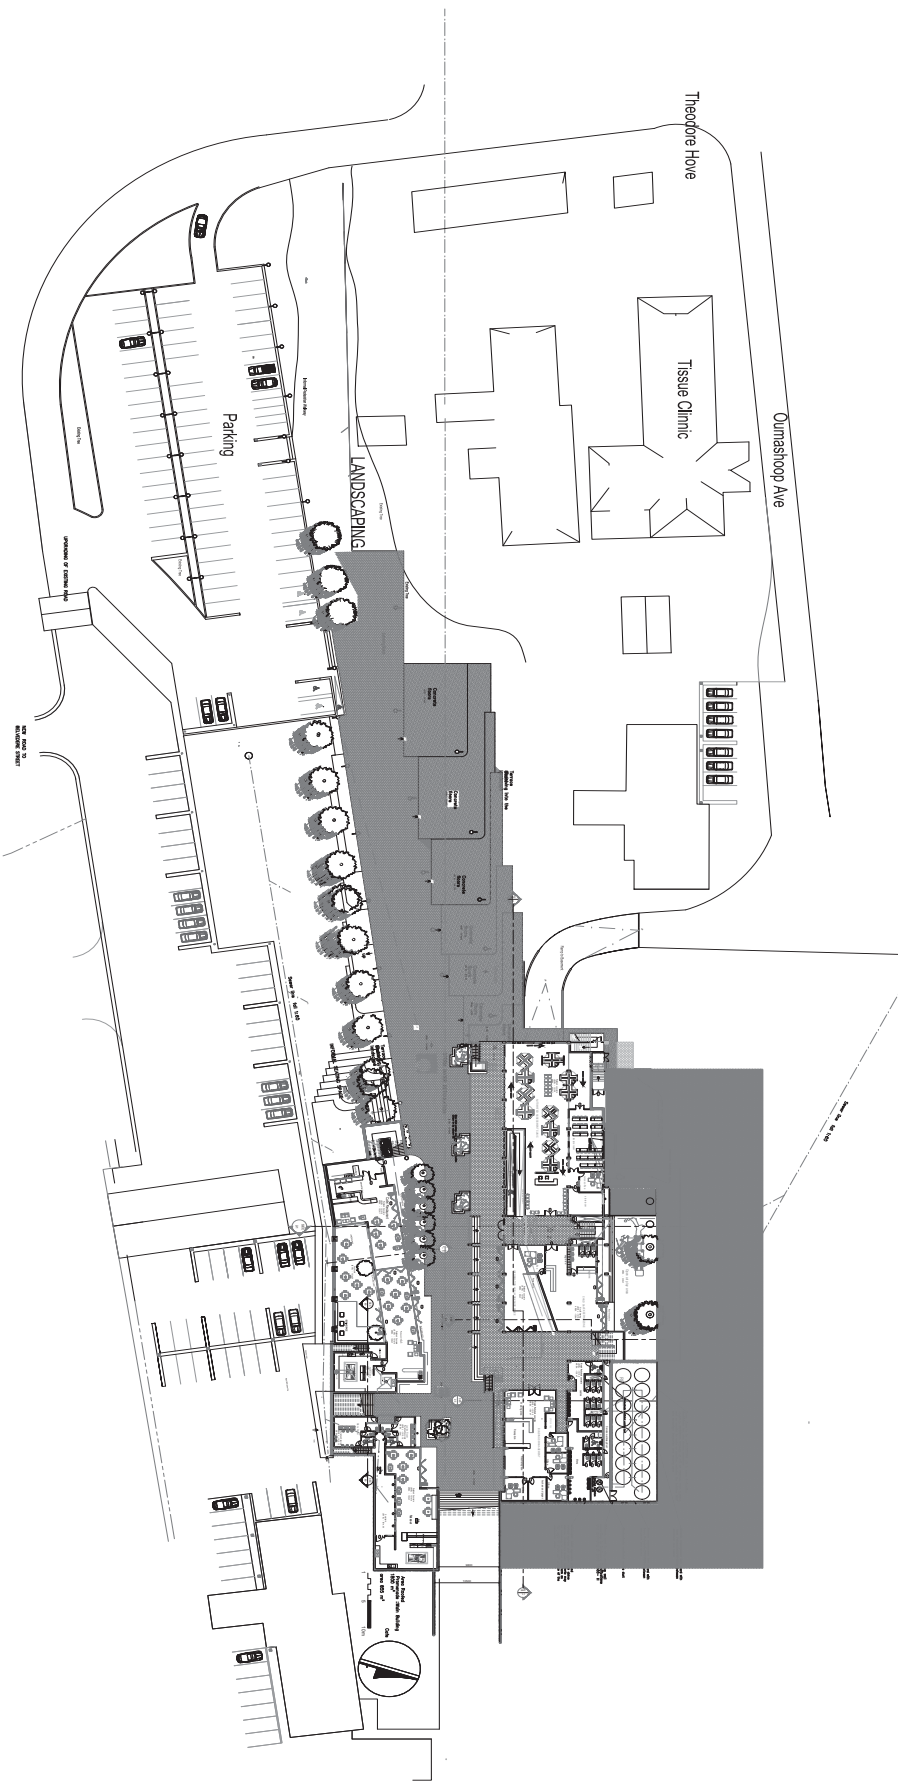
LOWER GROUND FLOOR PLAN:
